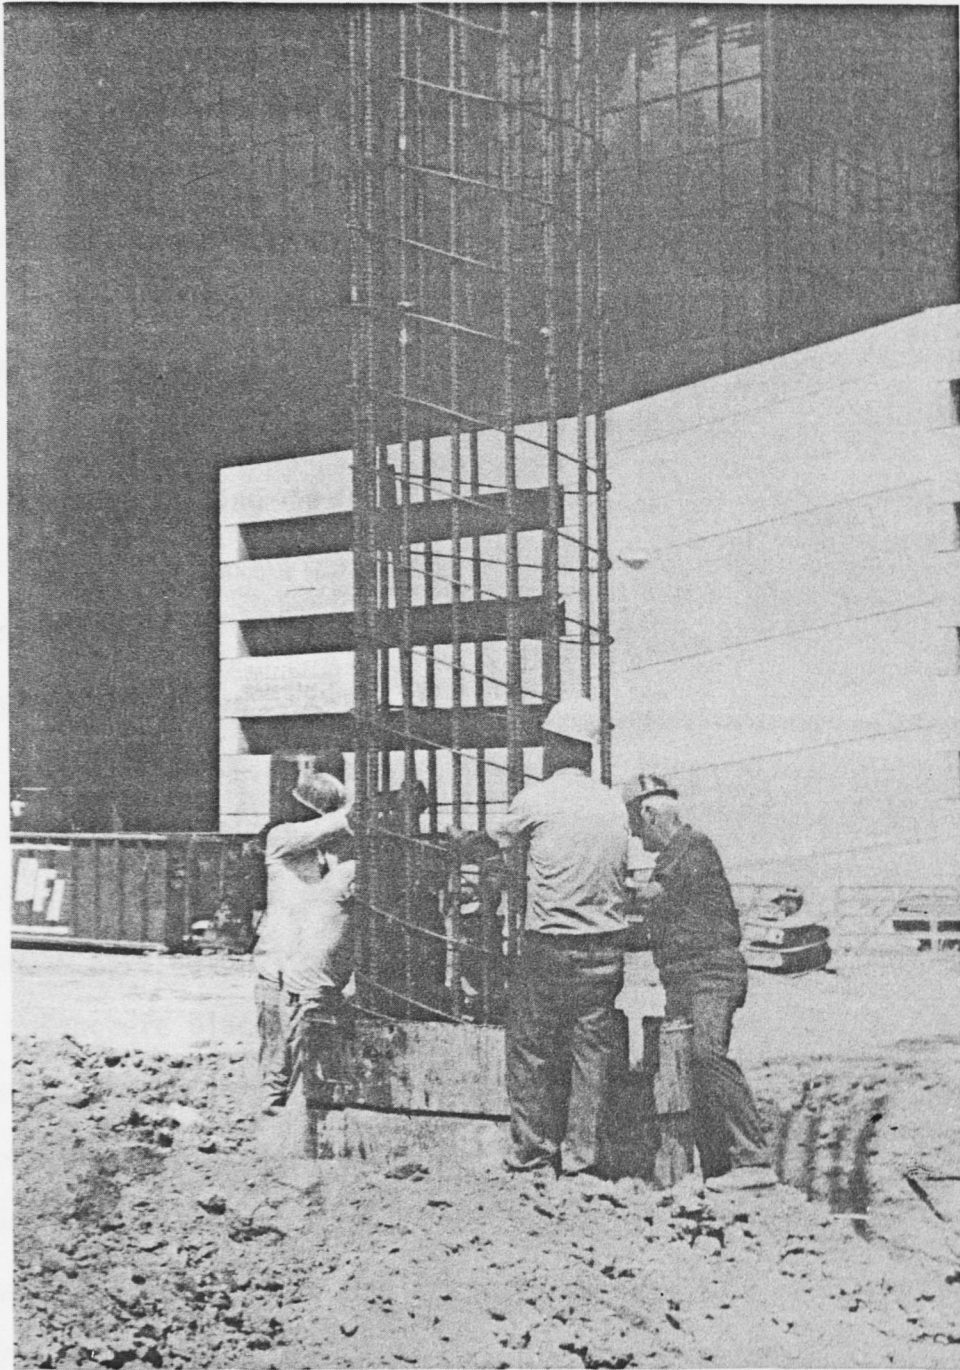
INSTRUMENTED CAGE BEING PLACED
